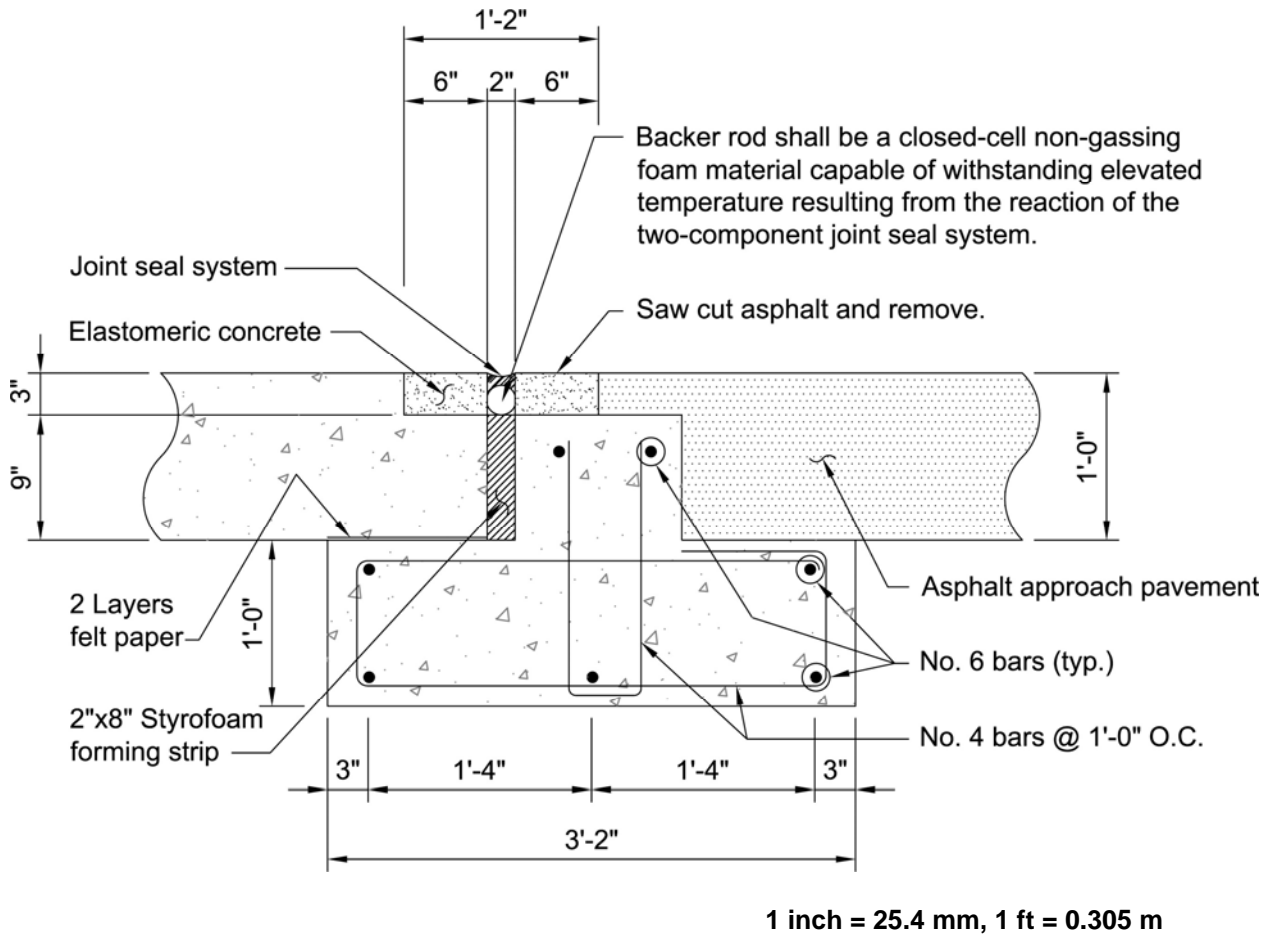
Sleeper pad detail suggested by Wasserman and Walker.⁽⁶⁴⁾
